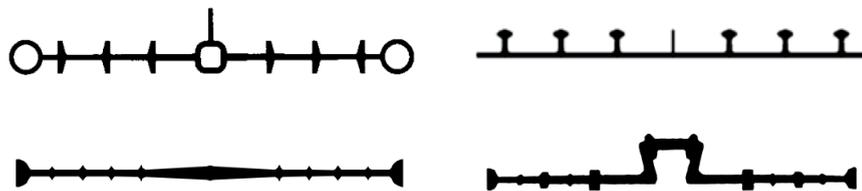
PVC Waterbar Designs for Water Retaining Structures [SIKA, 2014].
